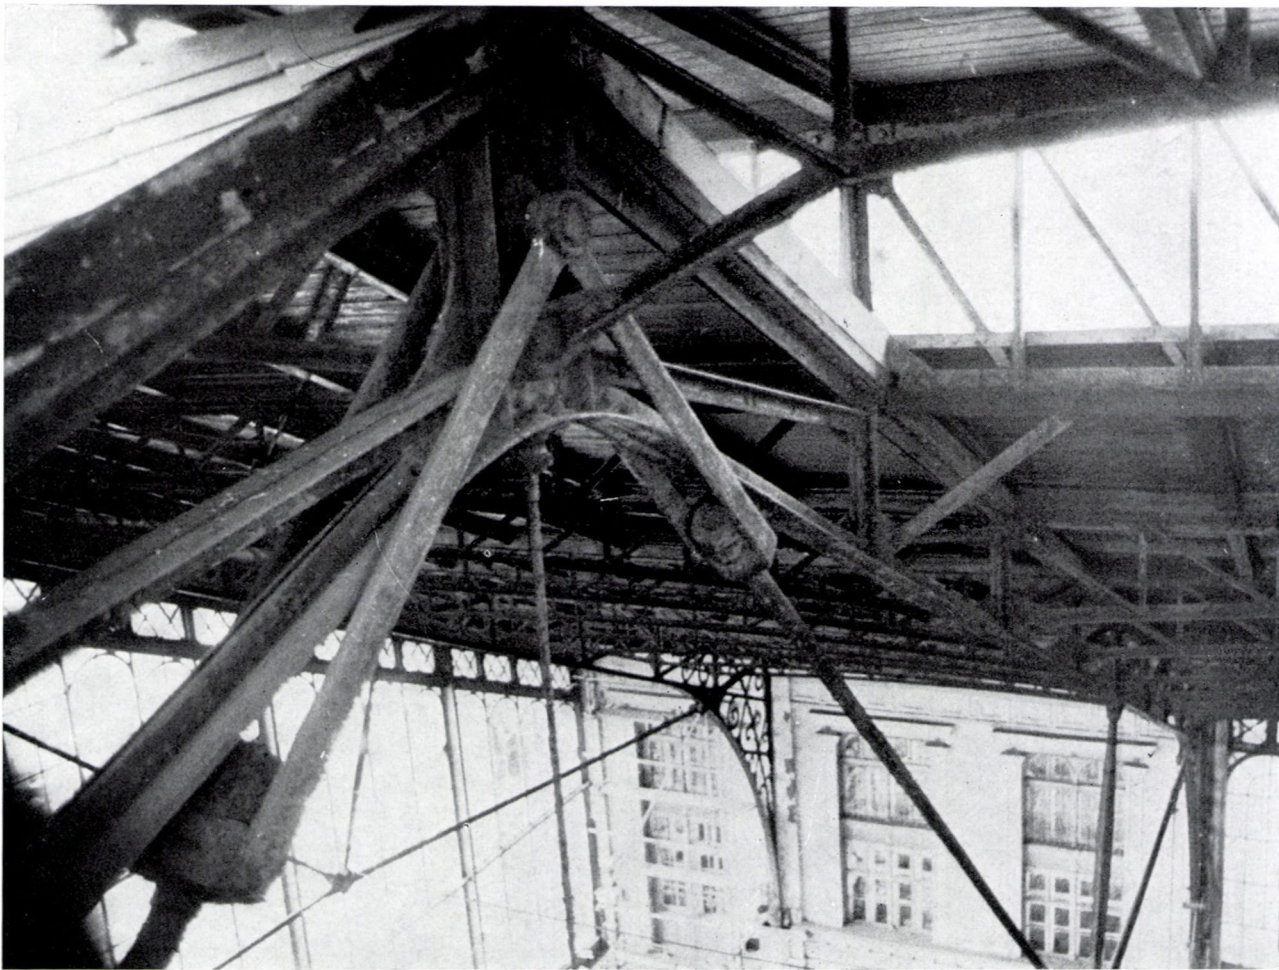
Sculpture-type structural detail: tension rod connection to the web. Corrosion of the structure is clearly seen
